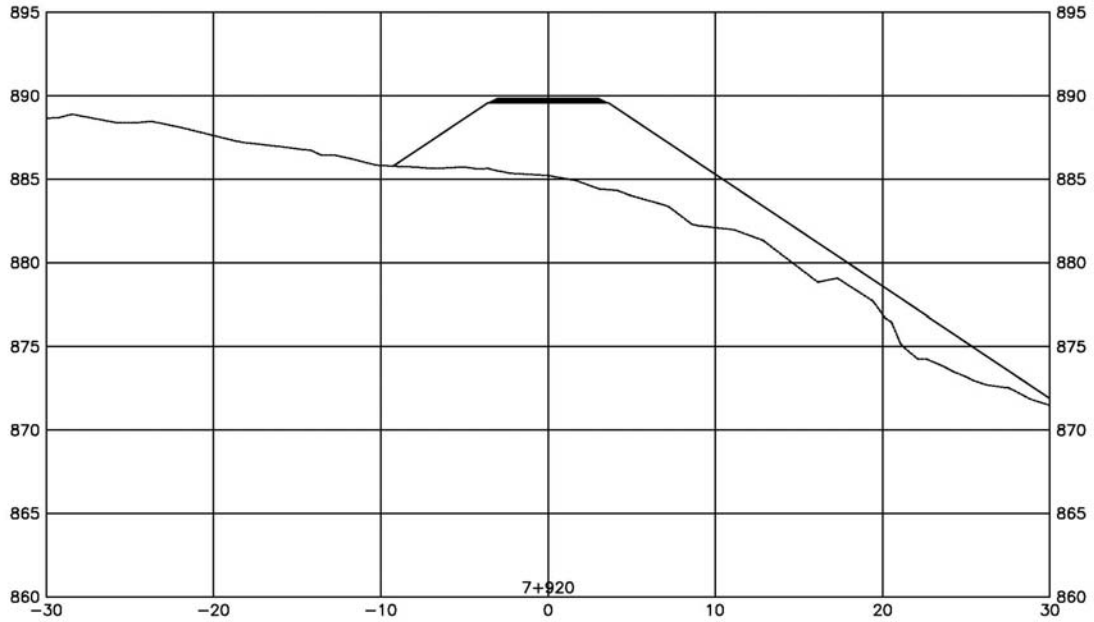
Example of a Proposed Road Section that was Flagged for Field Review
